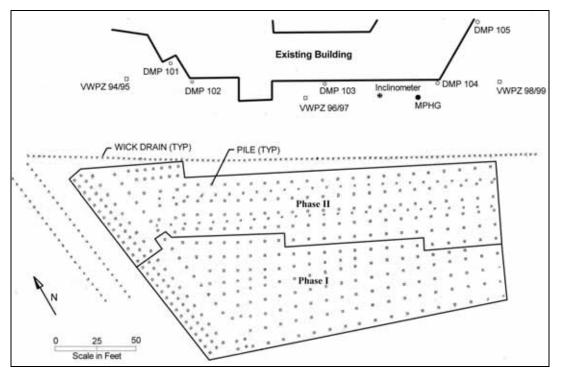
Site plan showing locations of piles, building footprint, and geotechnical instrumentation.
